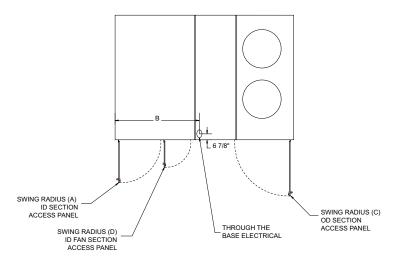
Heat Pump - Swing Diameter & Through the Base Electrical
